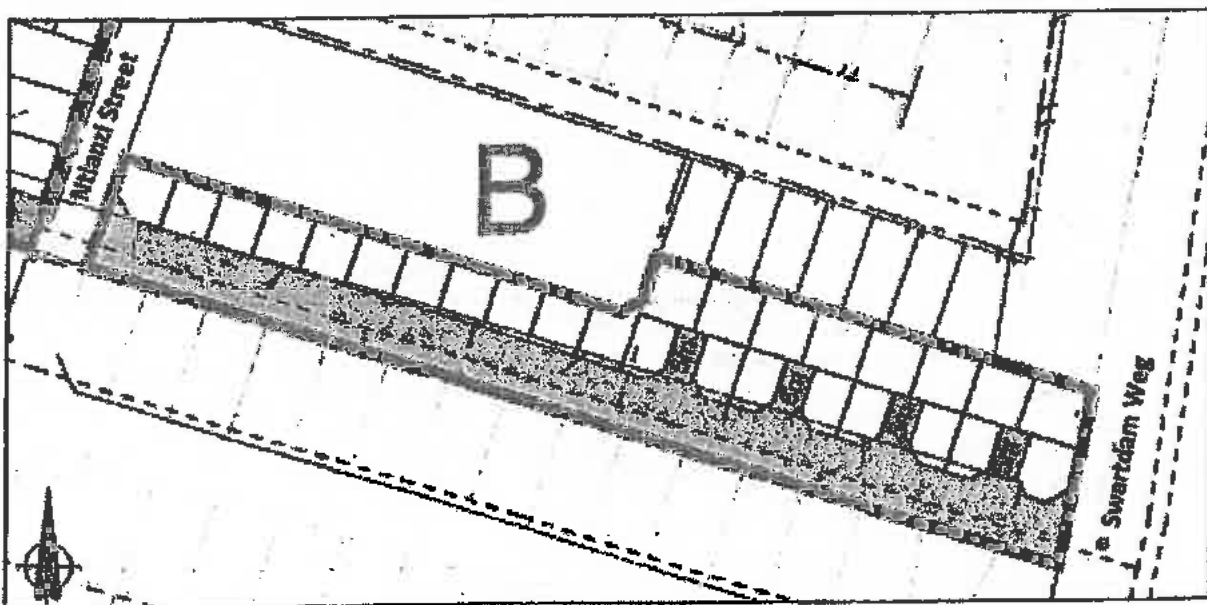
LAYOUT PLAN – APPLICATION AREA B: ASAZANI
